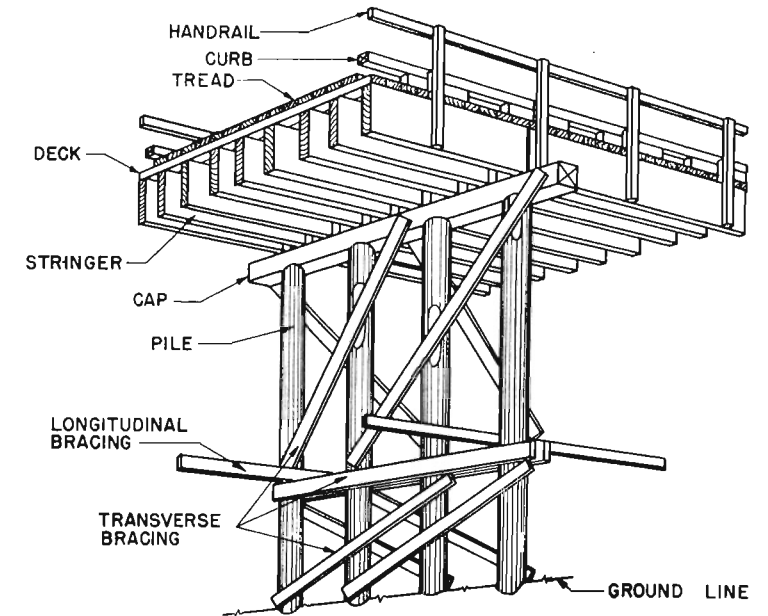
Highway bridge, class 50, single-lane, timber stringers on timber pile bent.
